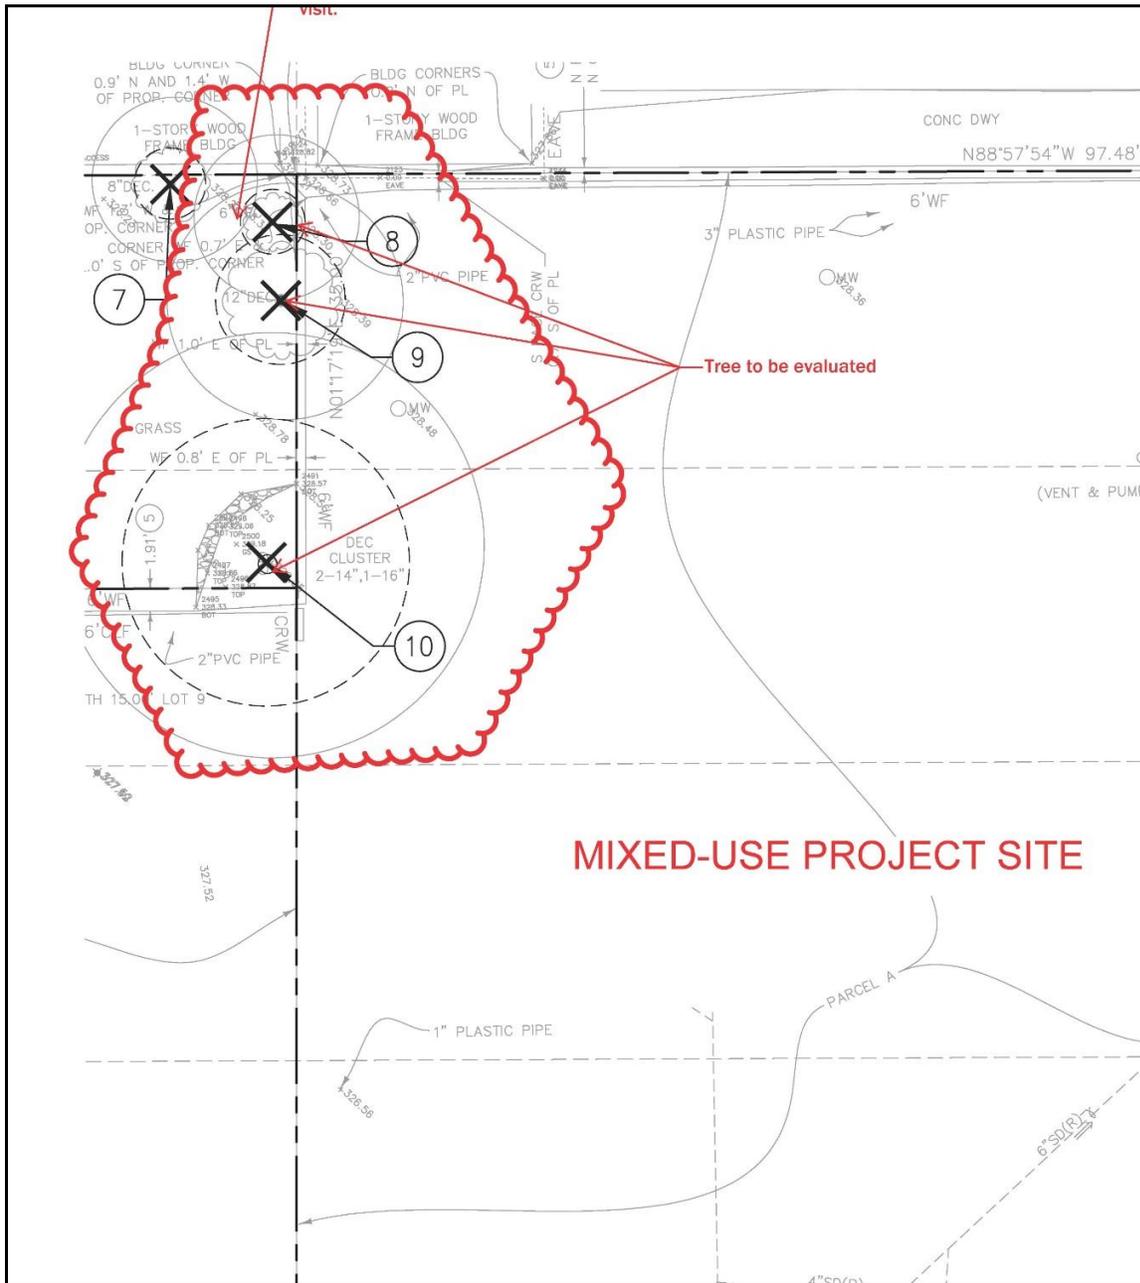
Partial Site Map as provided by Site Workshop dated 12.06.2017.
